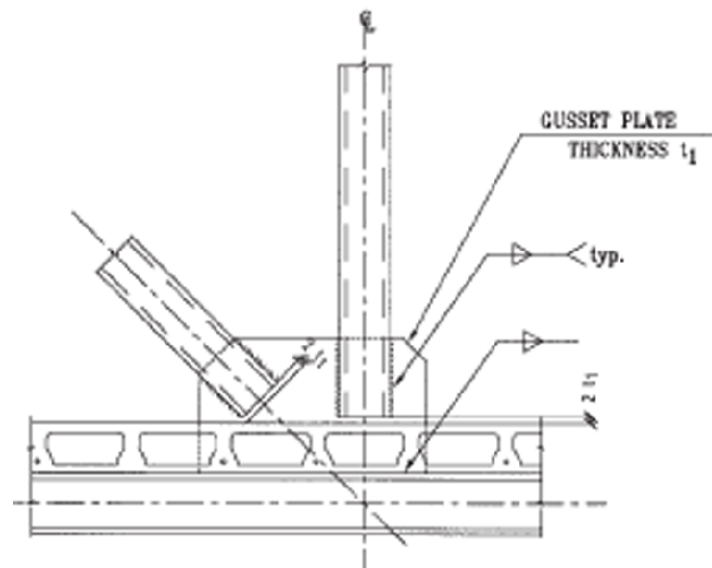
Typical Detail of Slotted HSS and Gusset Plate Connection
